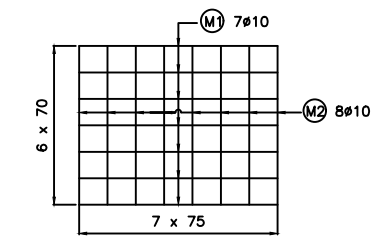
DETAIL ELASTOMERIC BEARING PAD GIRDER 40, 45 & 50
